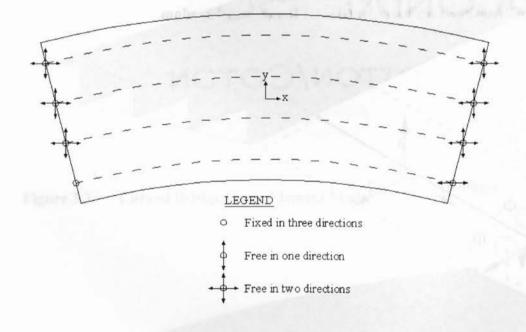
Bridge Bearing Support Arrangement Type SB
